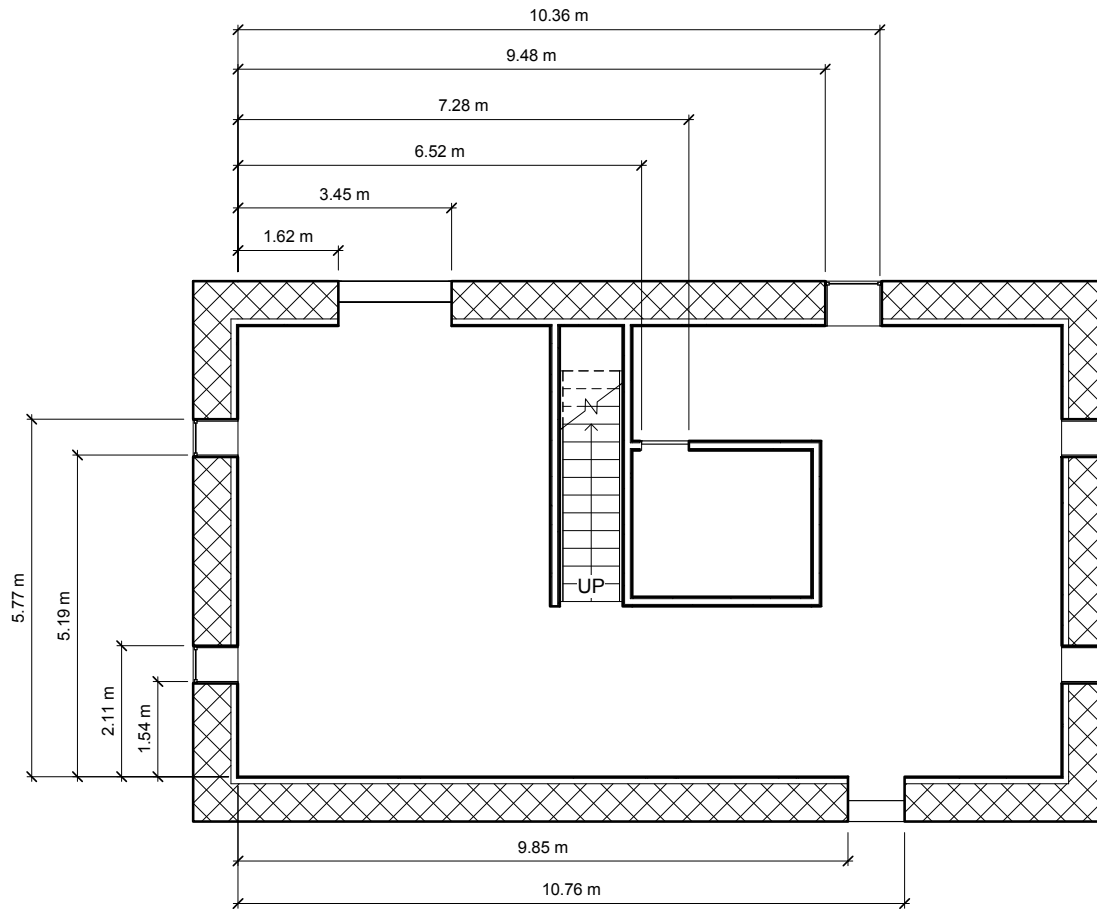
Fully Dimensioned Floor Plan of the Basement Vent Locations
